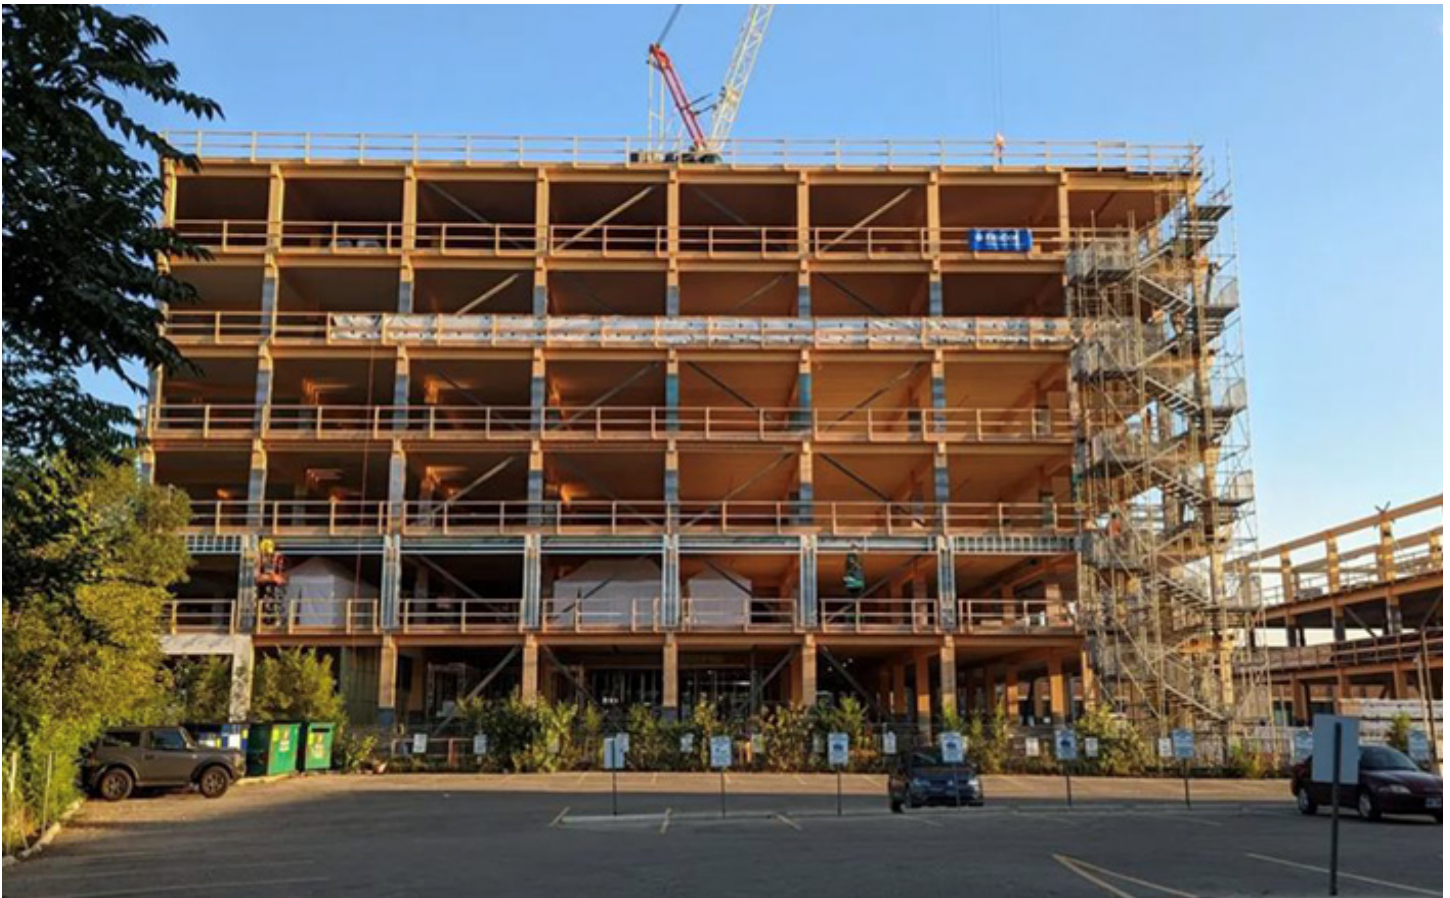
Six Storey Prefabricated Modular Condominium (60 units) (with Underground Parking)
